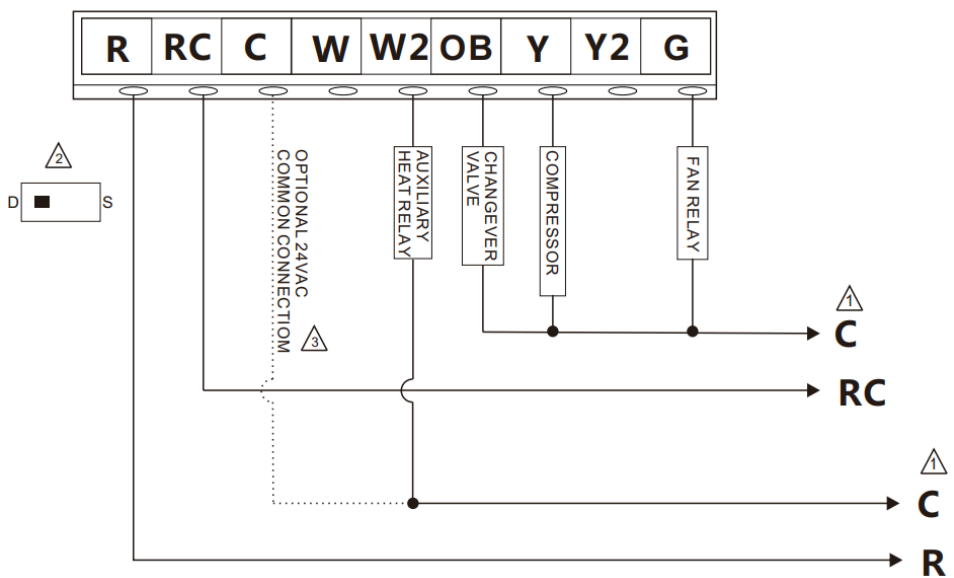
One-stage heat & cool in heat pump (with auxiliary heat)
